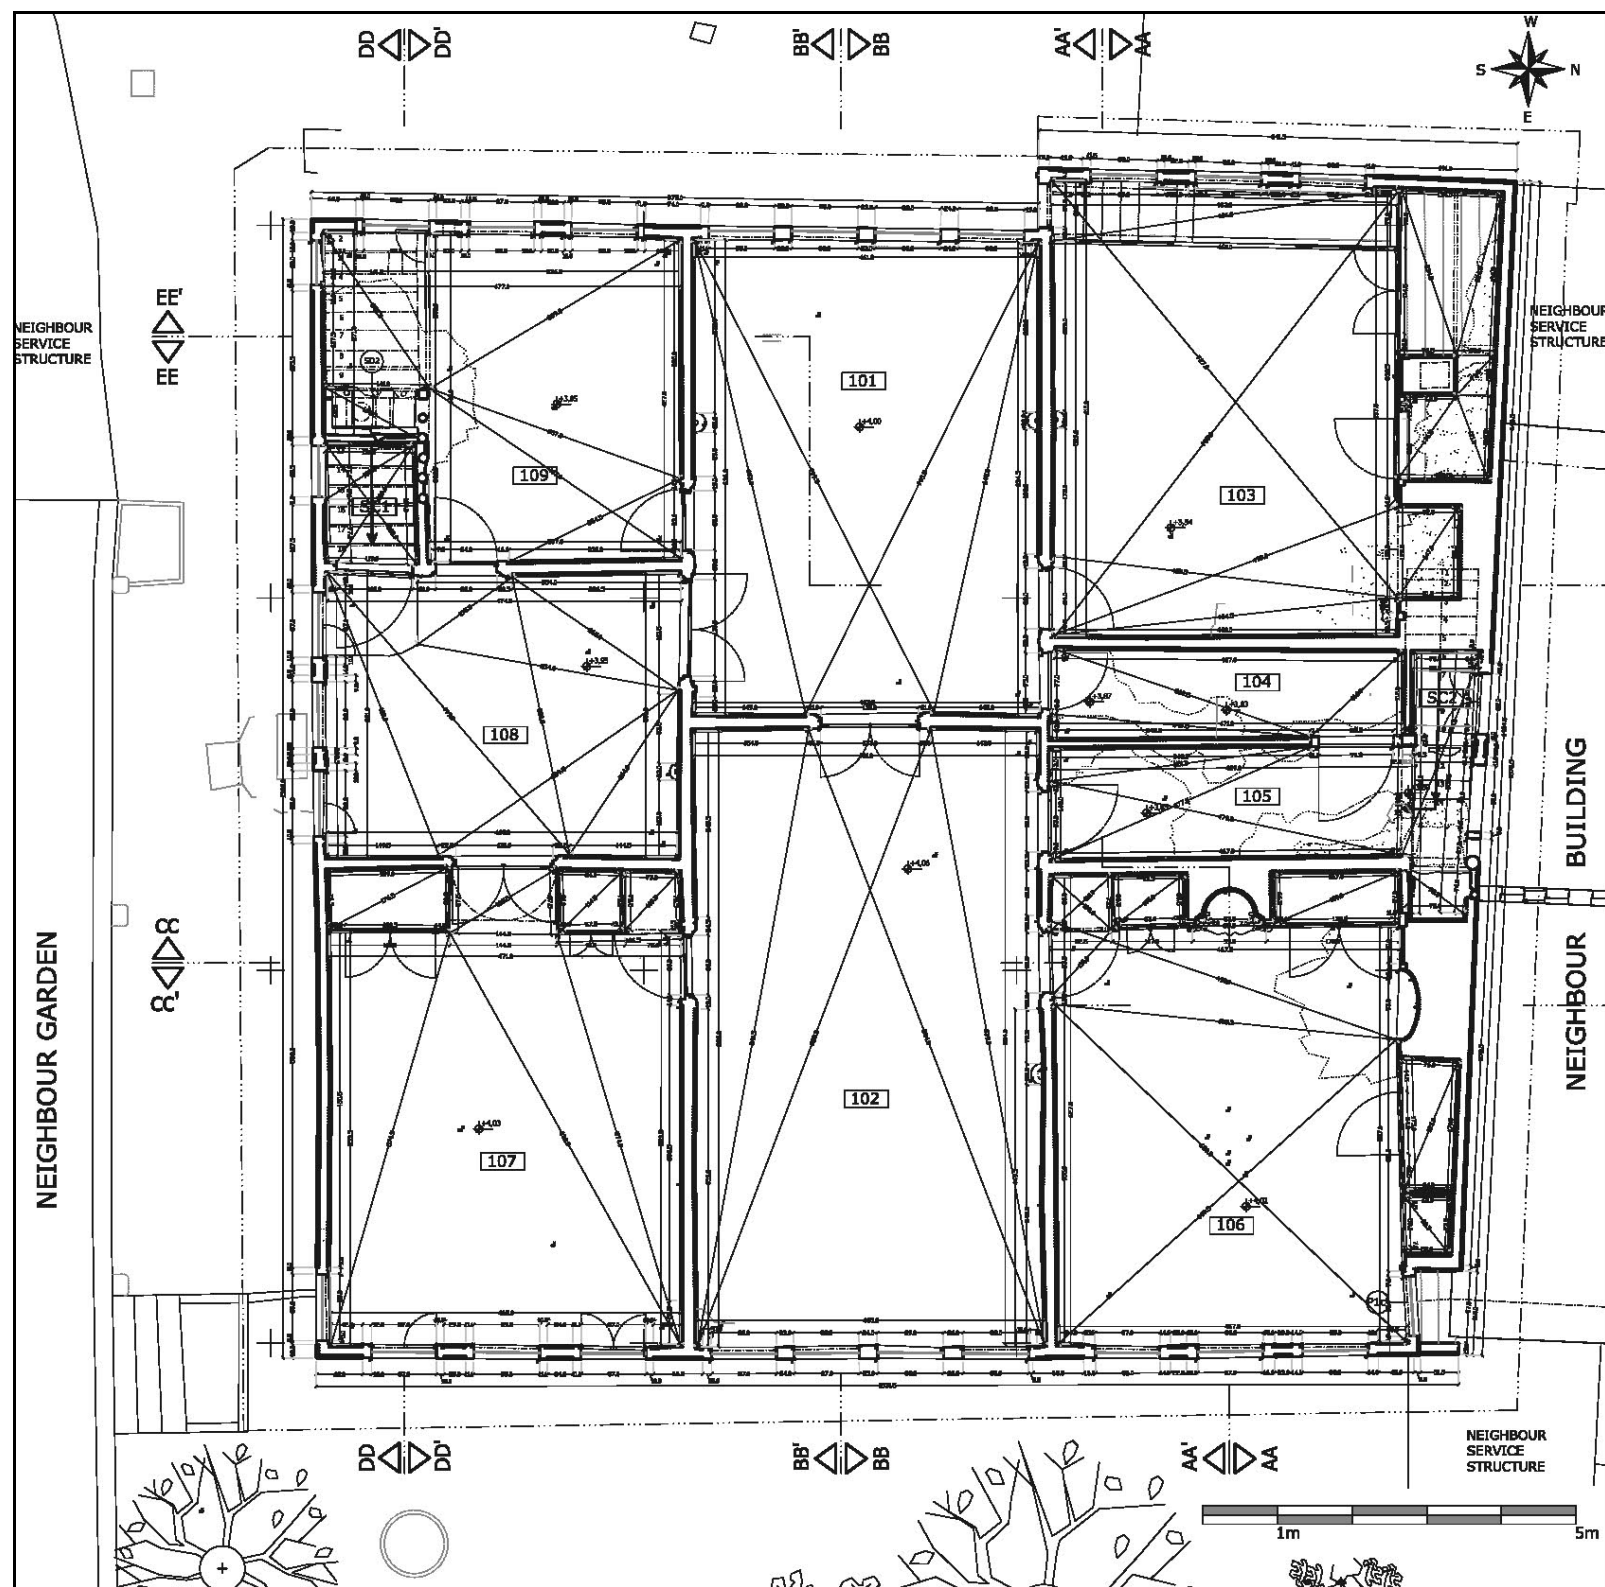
First Floor Plan: 1/100 (presented in 1/50 at Jury)
